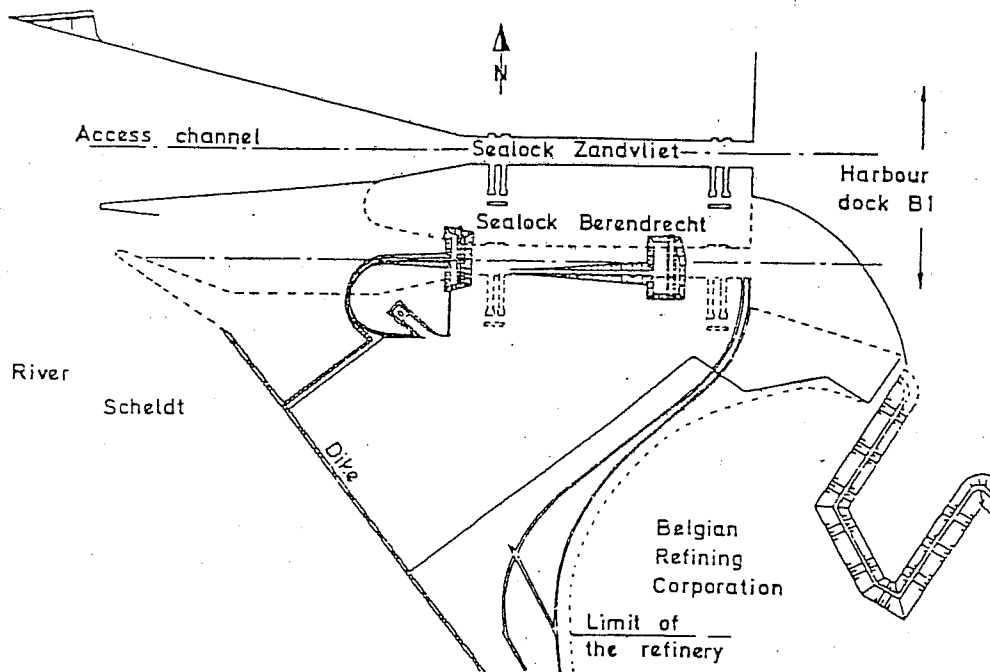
Situation of the two excavations for the divertment of conduit pipes
